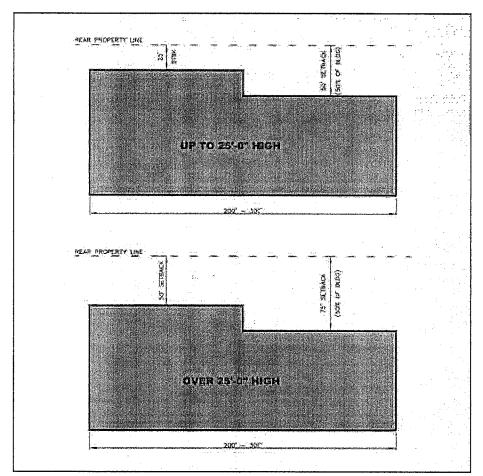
Setbacks for Buildings 200' to 300' wide on East side of Federal Highway
